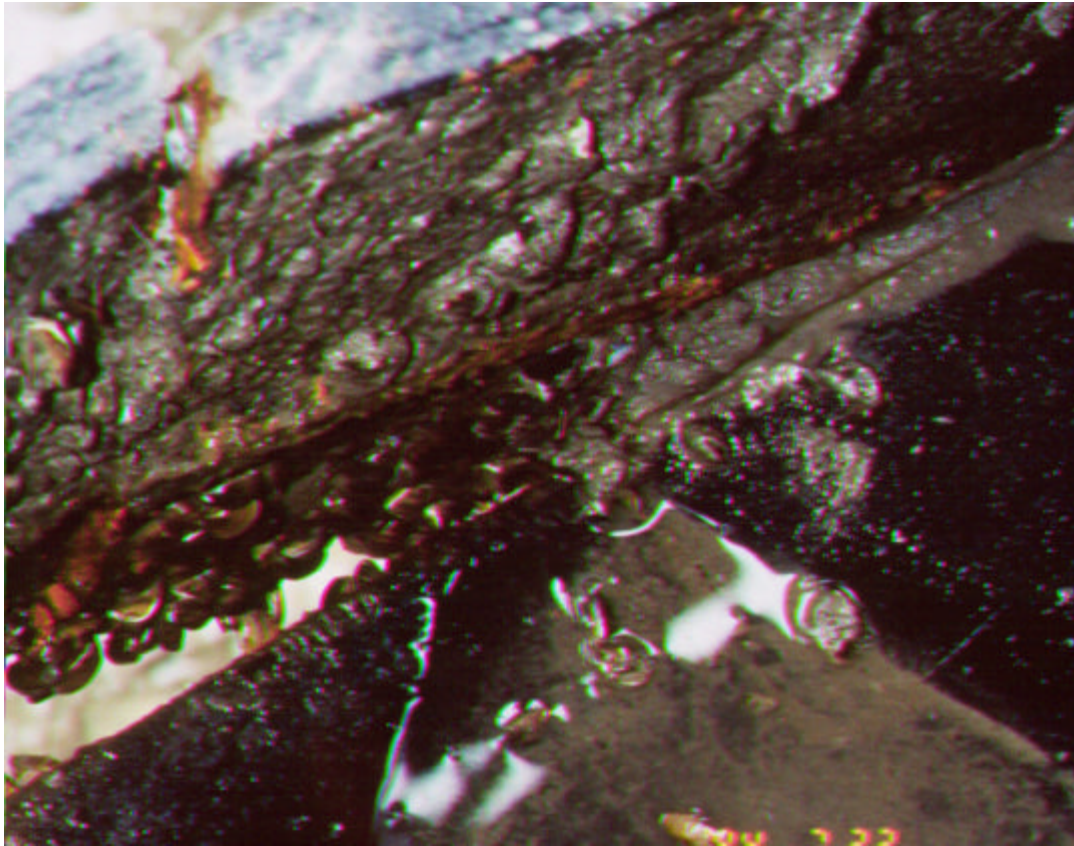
E Miter Gate Damage to Lower Girder Downstream Flange
